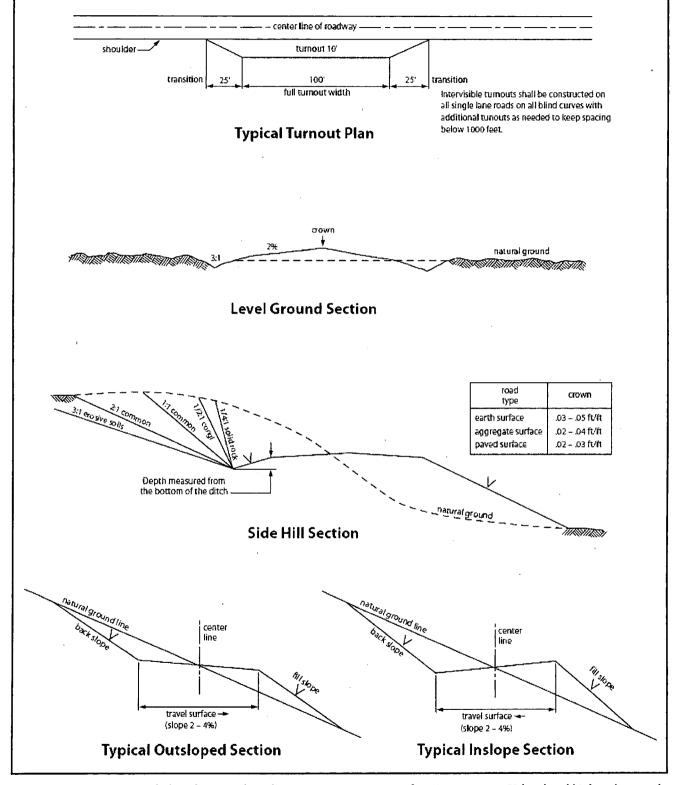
Cross-sections and plans for typical road sections representative of BLM resource or FS local and higher-class roads.
